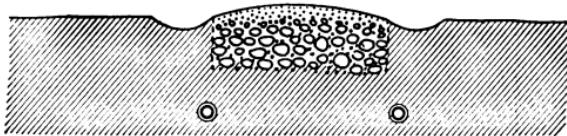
SECTION OF WALK OR DRIVE SHOWING LOCATION OF TILE.
